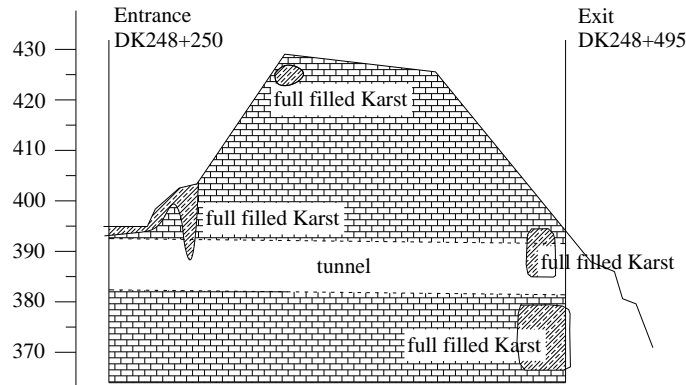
longitudinal sectional profile of the No.2 tunnel in Wuling mountain
